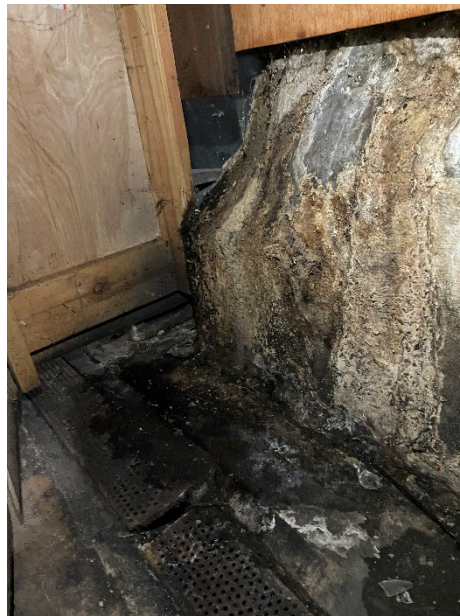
View of typical area of water intrusion at west foundation wall, basement floor. (Photo taken by P&T 03/14/2025)
